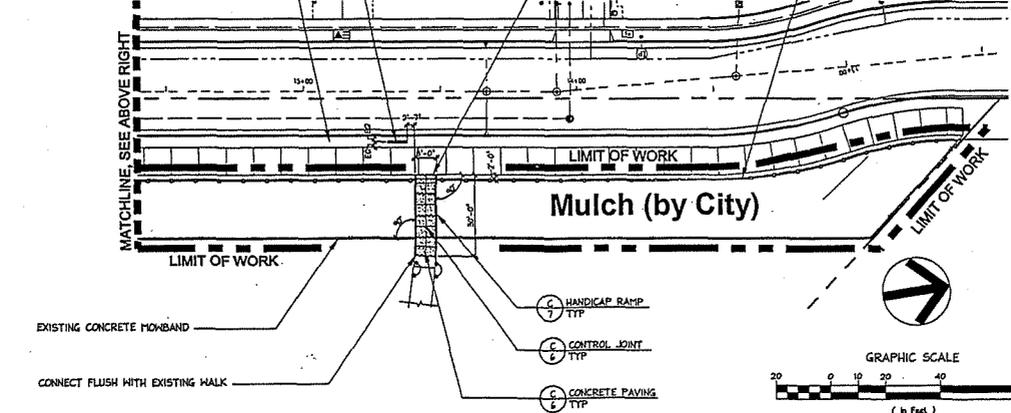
MARTIN PARK IMPROVEMENTS/22ND STREET INTERFACE & ACCESS
